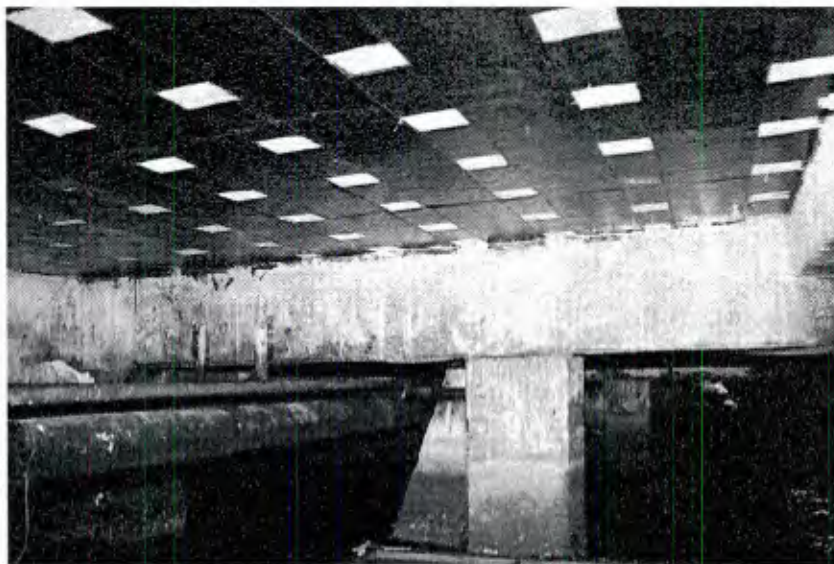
Finished installation laminate reinforcing grid on the north lane.
